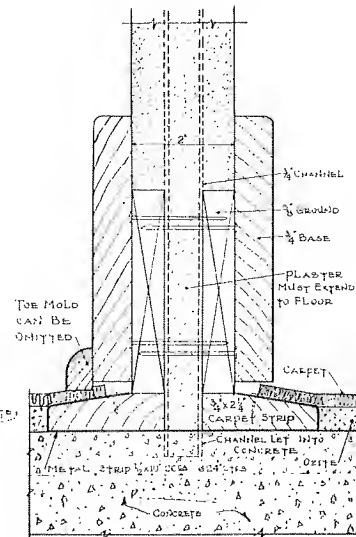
Carpet Strip and Metal Anchor, Heldenbrand Hotel, Pontiac, Mich.
